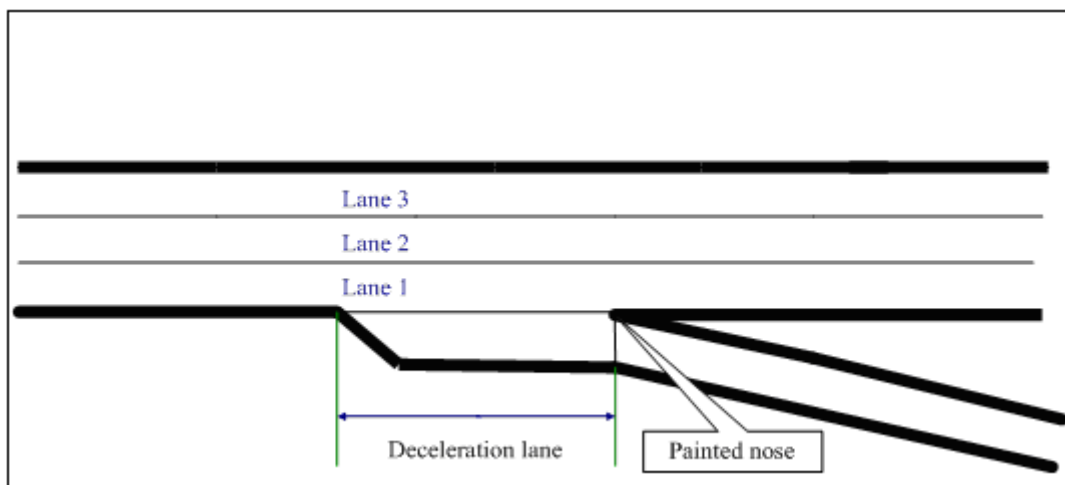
Type 1 Exit Ramp: Parallel from a Tangent Single-lane Exit Ramp
